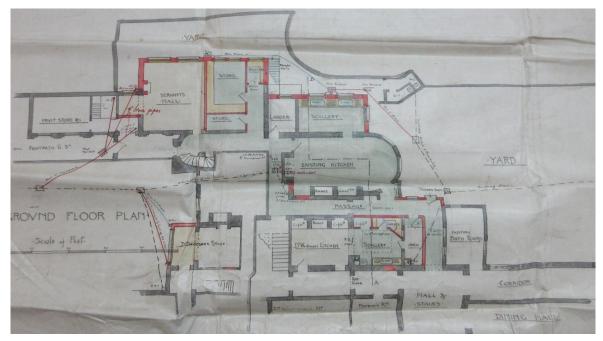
Ground floor plan – proposed rear and side extensions to George House, including re-modelled kitchens and an extension to a study, 1920.
